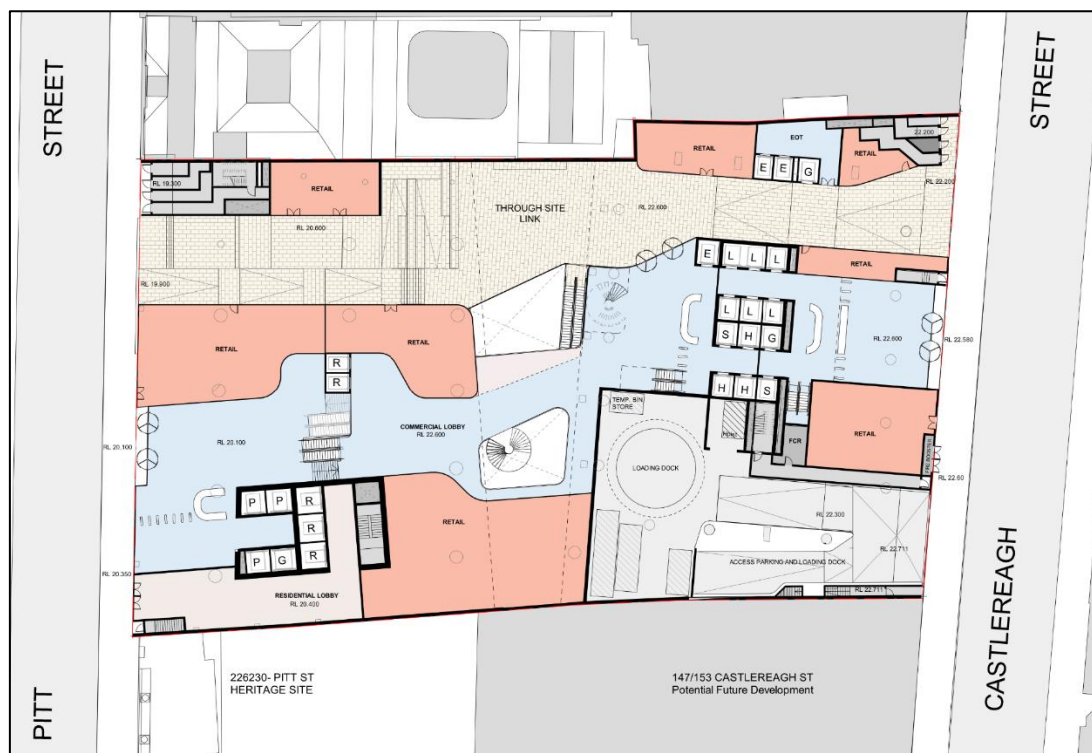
Stockland Piccadilly Complex – Concept Reference Design - Ground plan (3XN, 550029- Mixed Use, SK-11-100)
